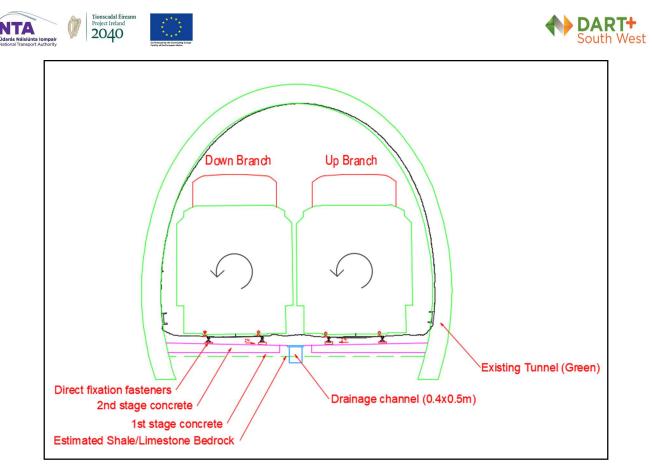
Proposed Cross Drainage System at Phoenix Park Tunnel
